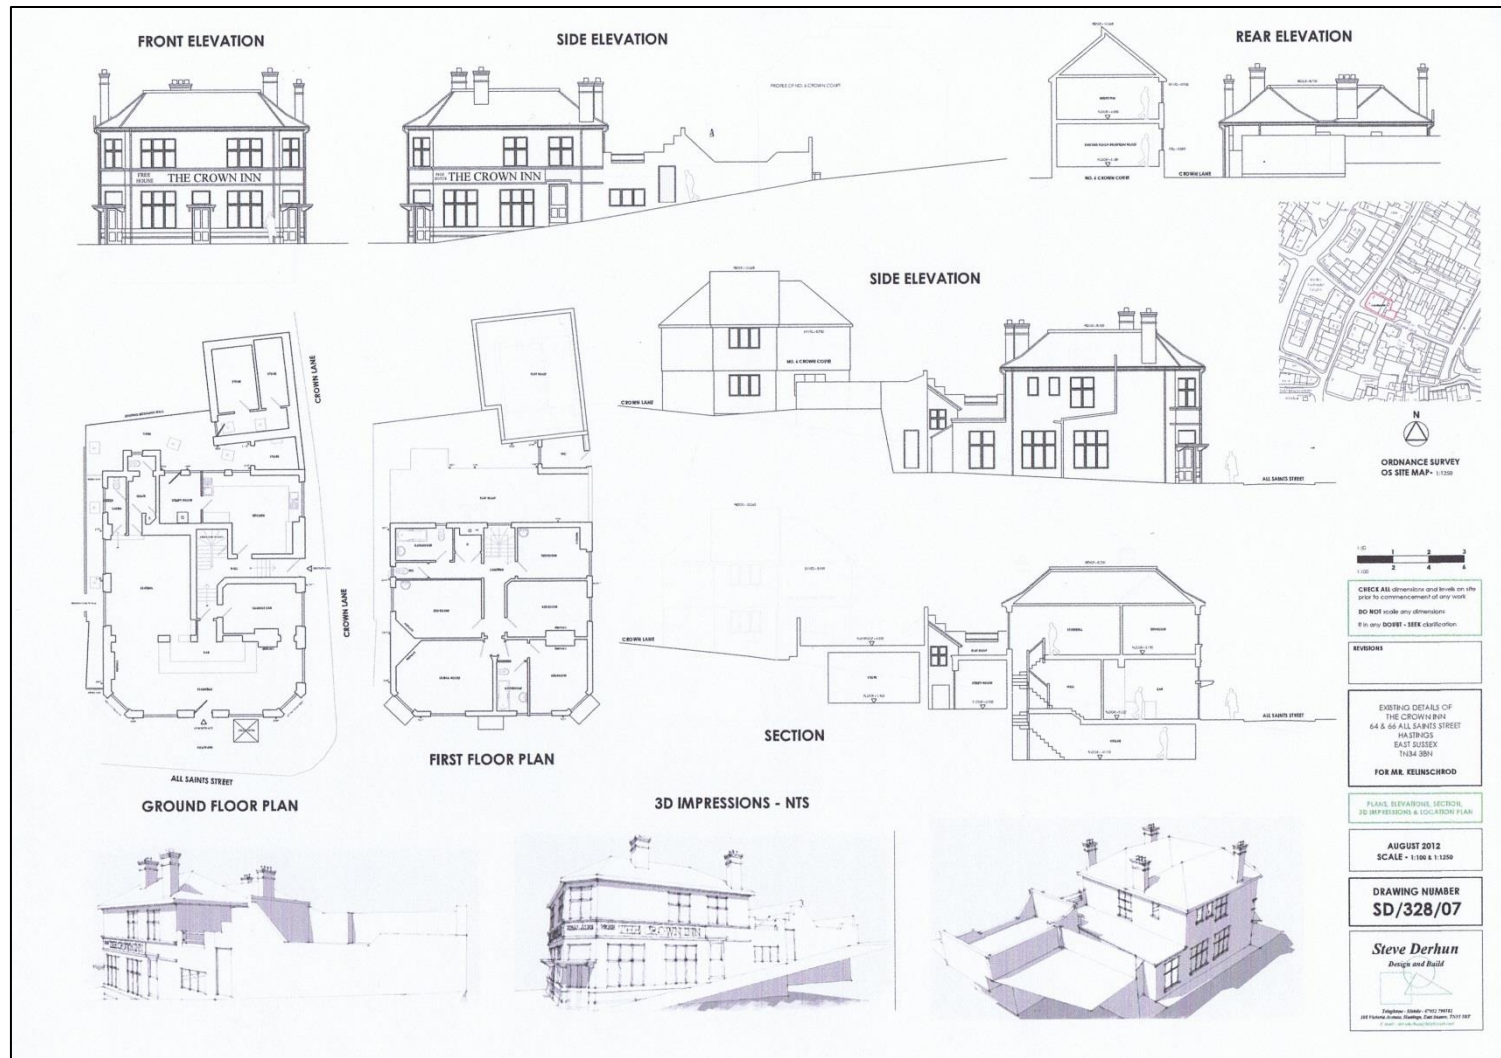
Crown Inn, Hastings: Existing Plans and Elevations
